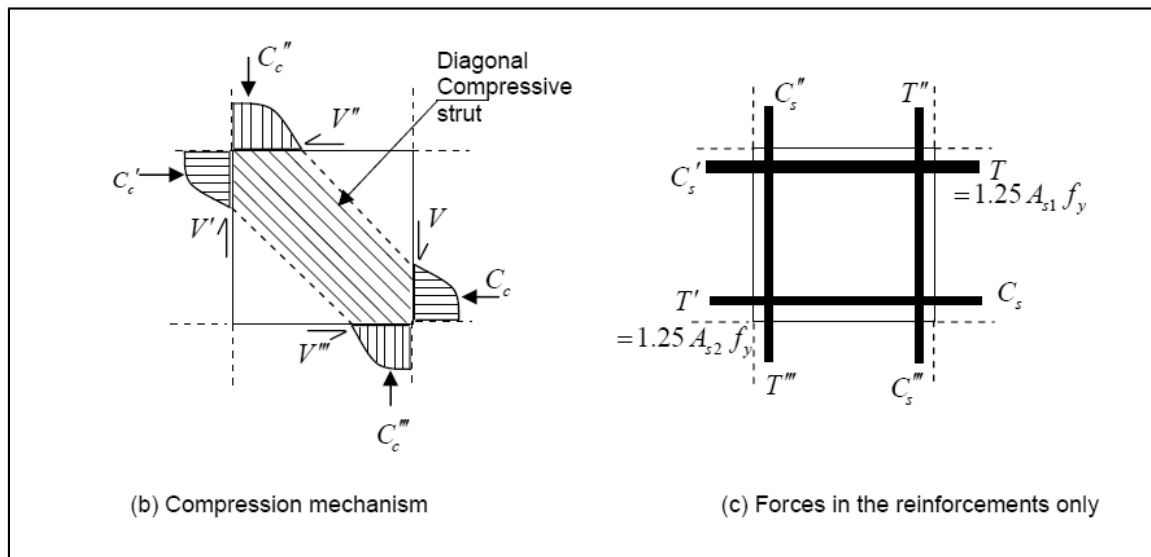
Idealized Behavior of Beam Column Joint (Uma and Prasad 2006)
